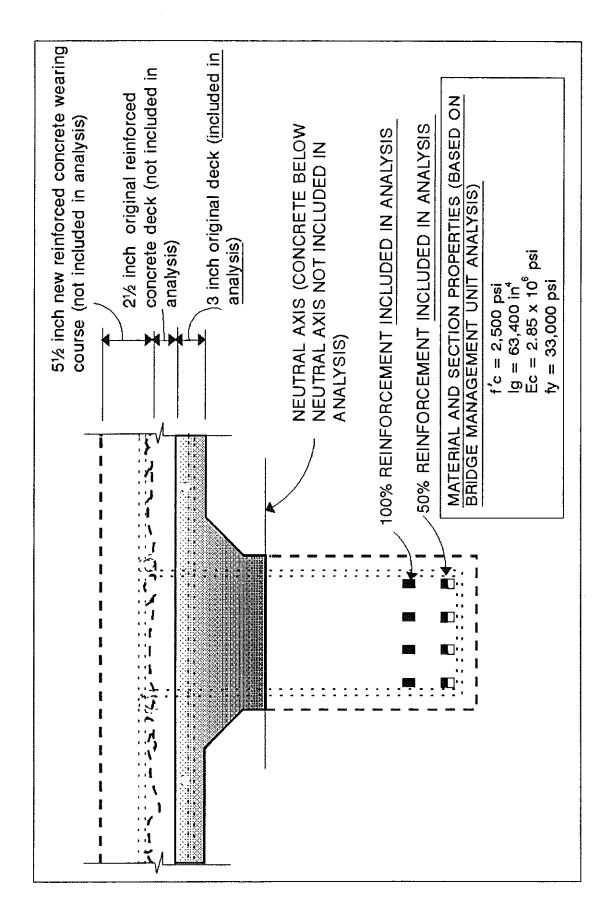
PRE-TEST ESTIMATED SECTION FOR INTERIOR BEAMS
